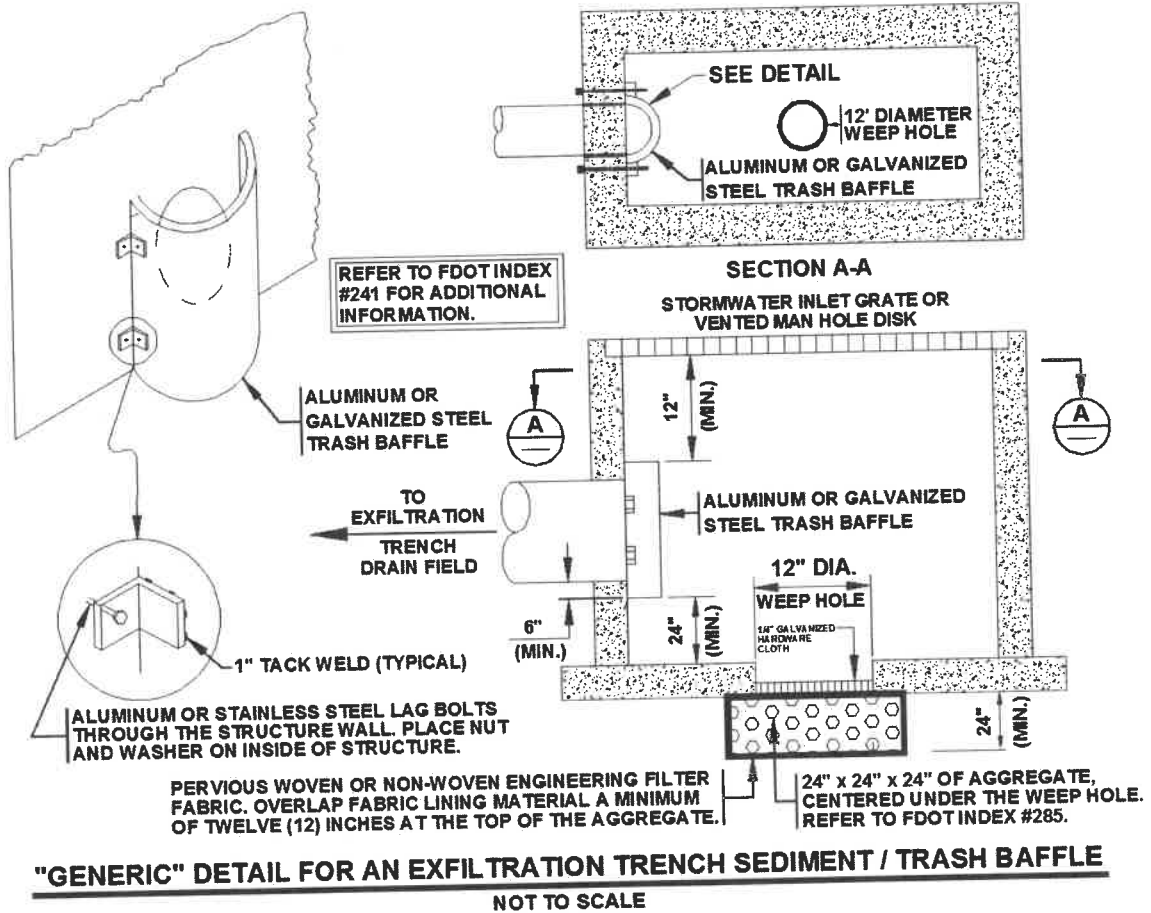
Detail for Exfiltration Trench Trash Baffle
